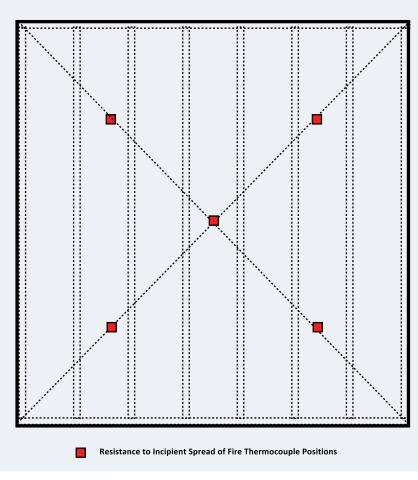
Elevation of a wall showing RISF thermocouple positions.
